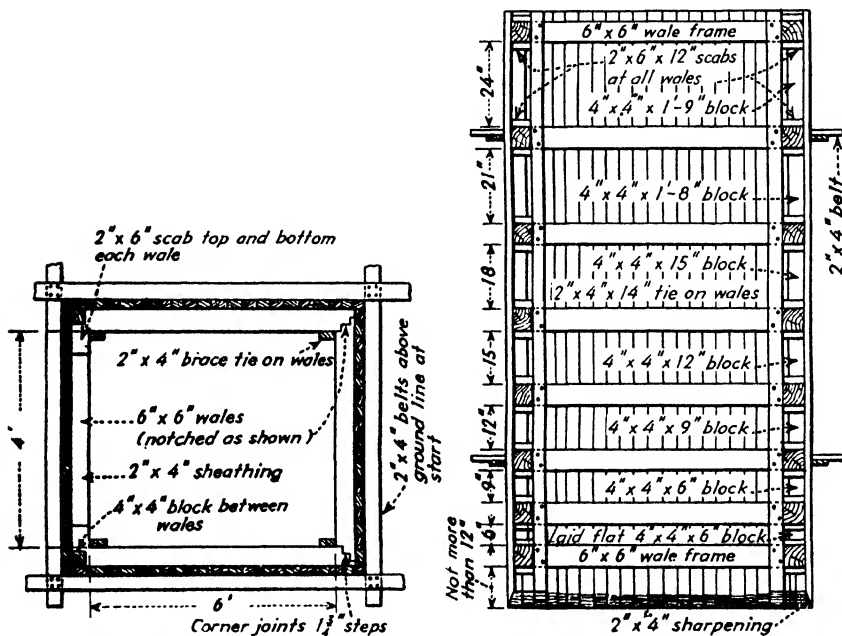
Test Pit Used by the New Mexico State Highway Department.
